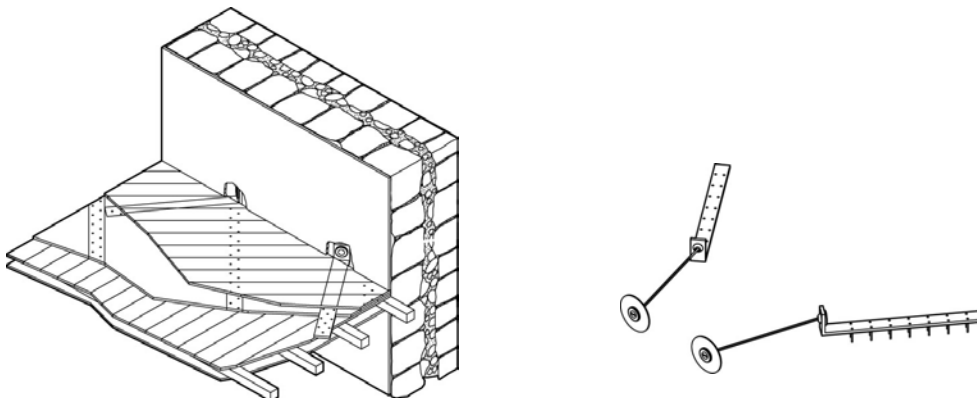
Connection devices between timber floors and masonry. Longitudinal direction.
